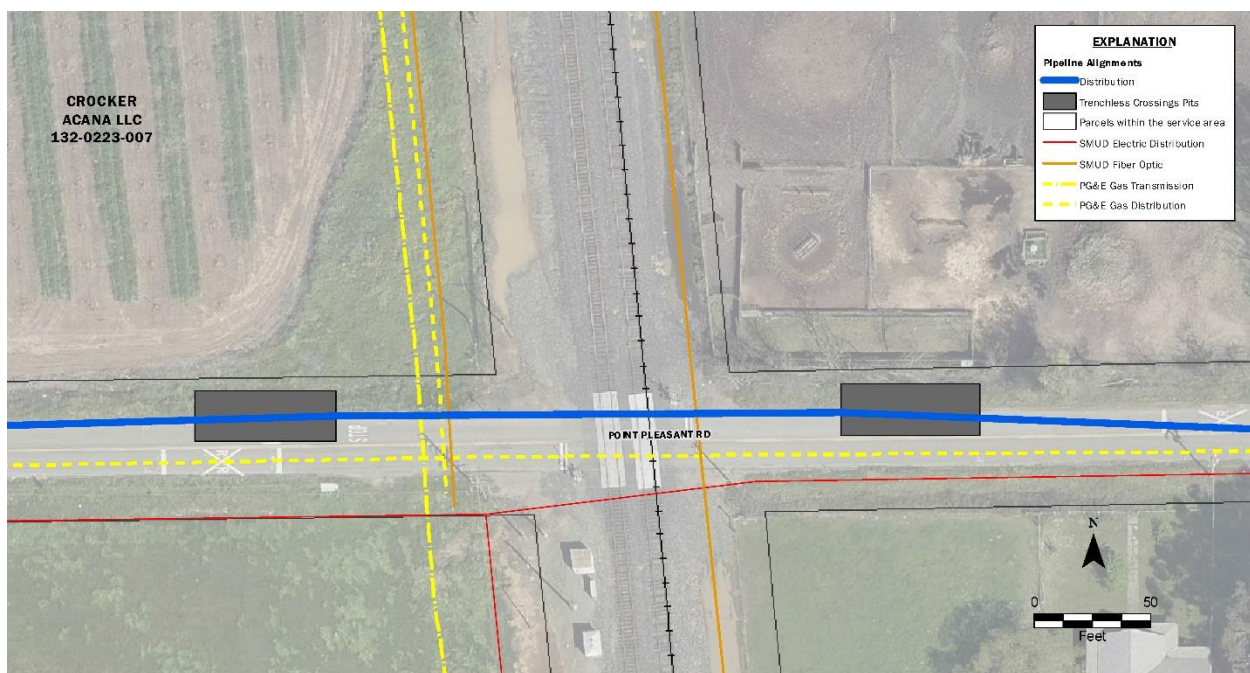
Proposed Trenchless Crossing of UPRR at Point Pleasant Road
